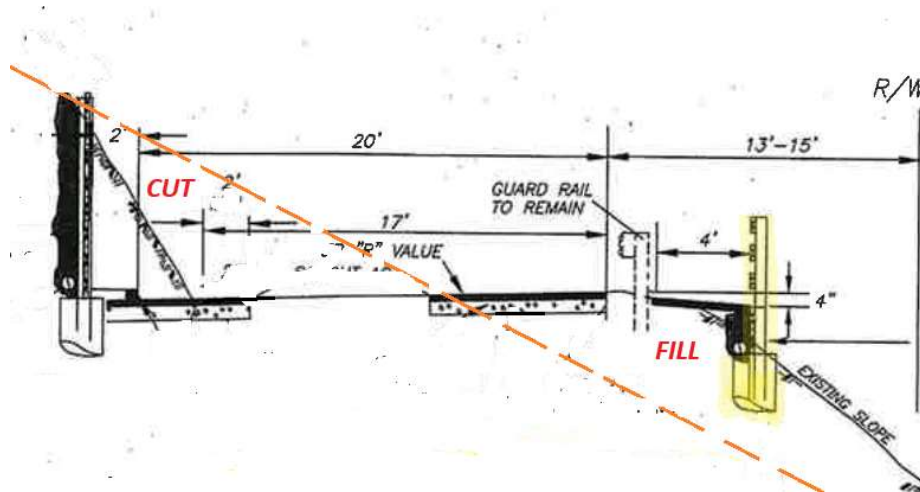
Schematic Cross Section, the highlighted wall is to be replaced.
